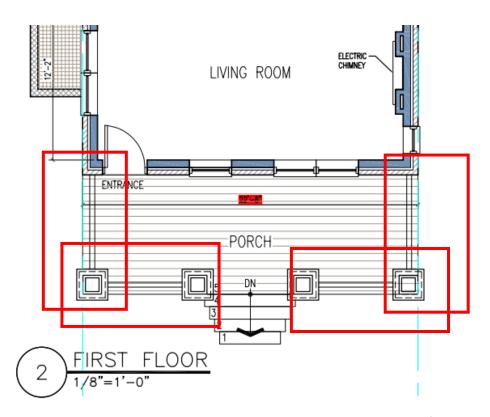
Figure D: First Floor Plan Indicating Porch Railing at Front and Sides of Porch
